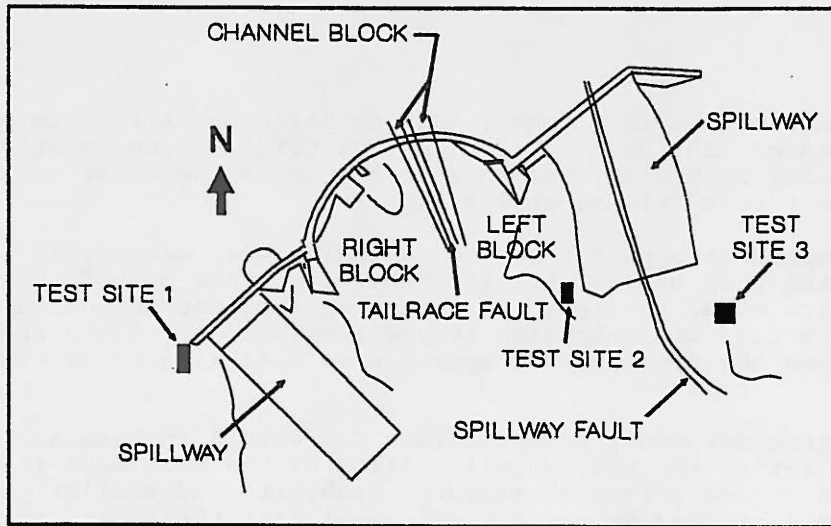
Simplified plan of Stewart Mountain Dam, AZ.
